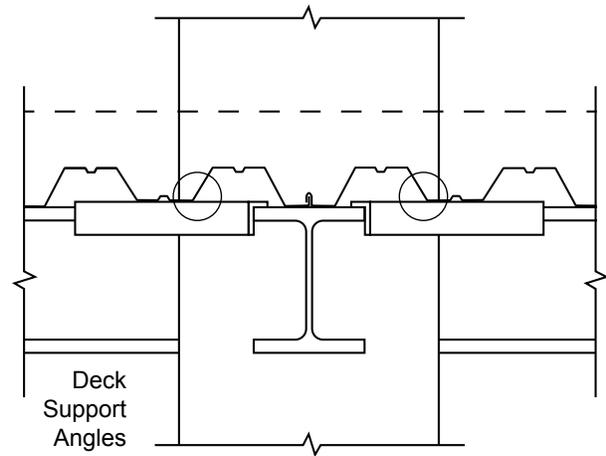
COLUMN DETAIL REQUIRING DECK SUPPORT ANGLES
